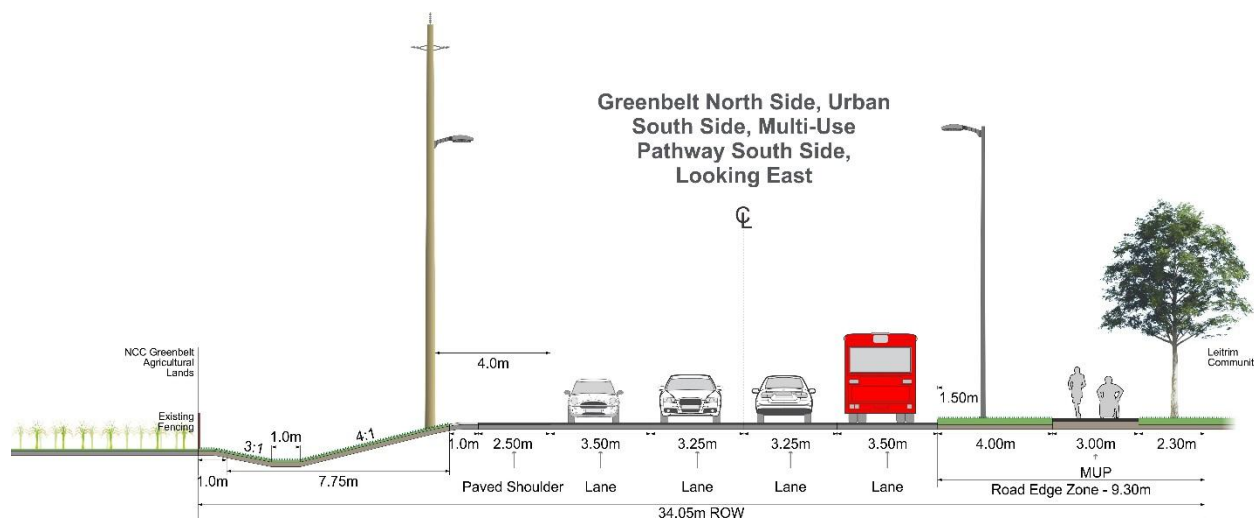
Leitrim Road – Existing Leitrim Road to Bank Street
